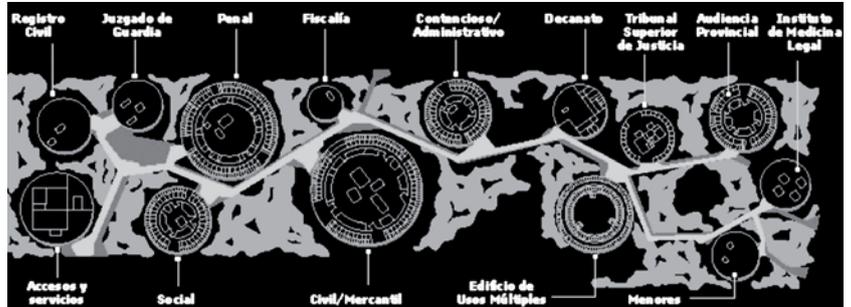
FLPSL, CJM - Campus de la Justicia de Madrid, site plan (source: <http://constructalia.arcelormittal.com>)
